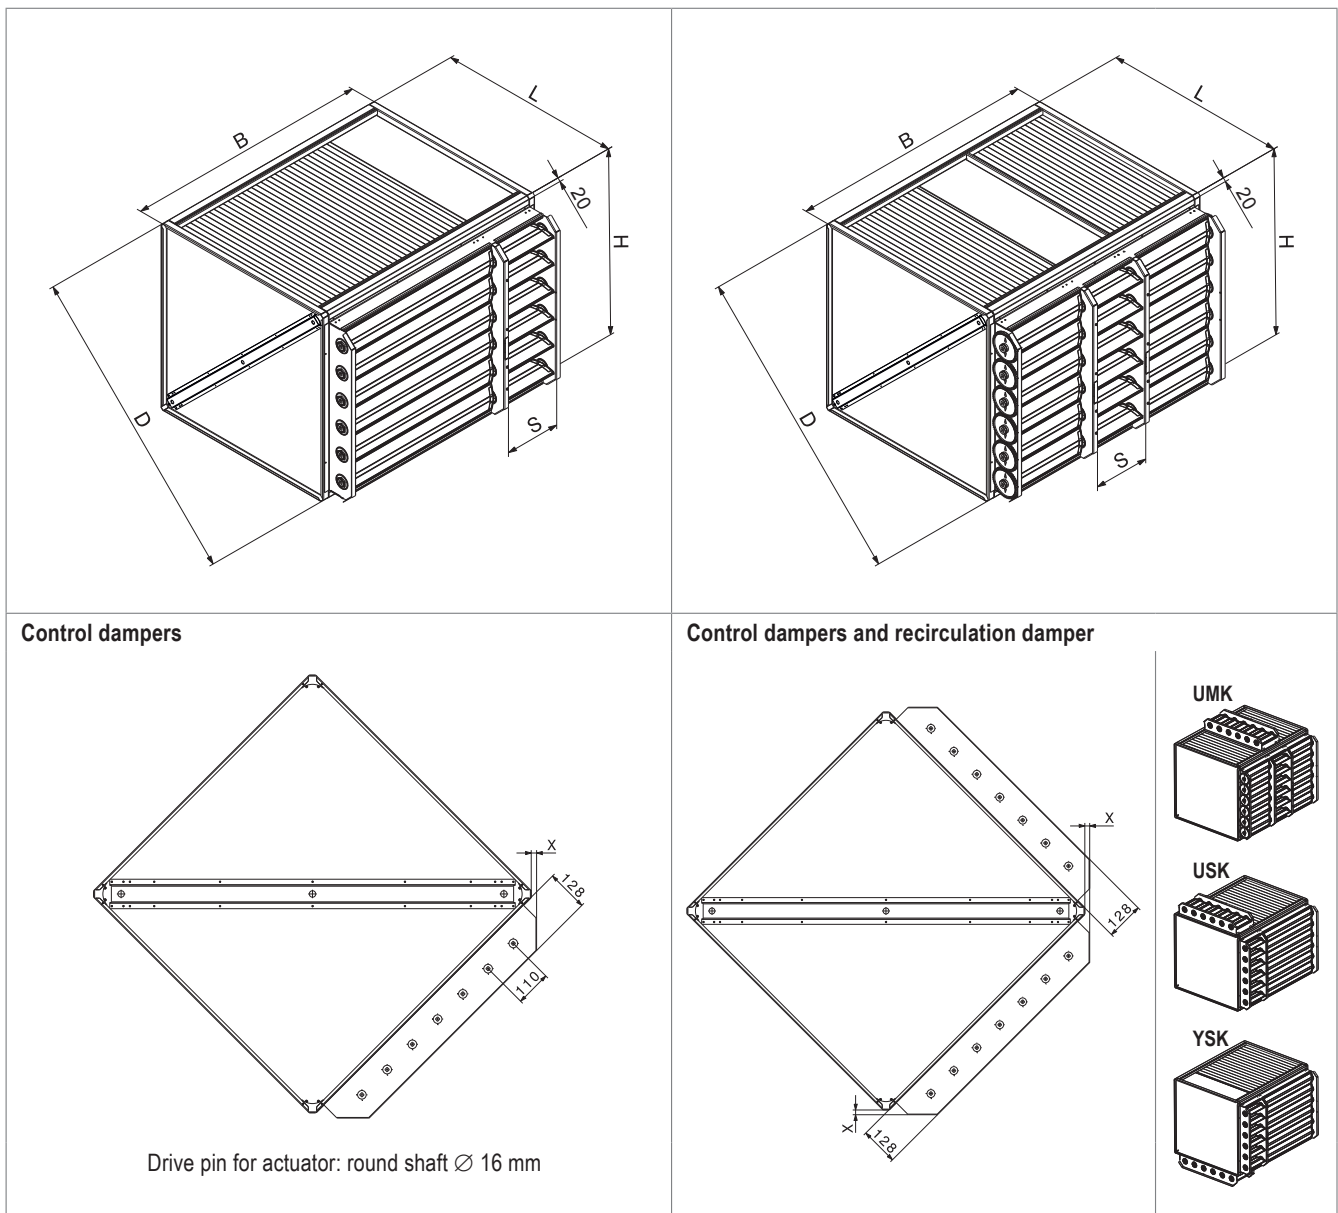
Dimension sheet for design F plate heat exchanger with dampers (dimensions in mm)
